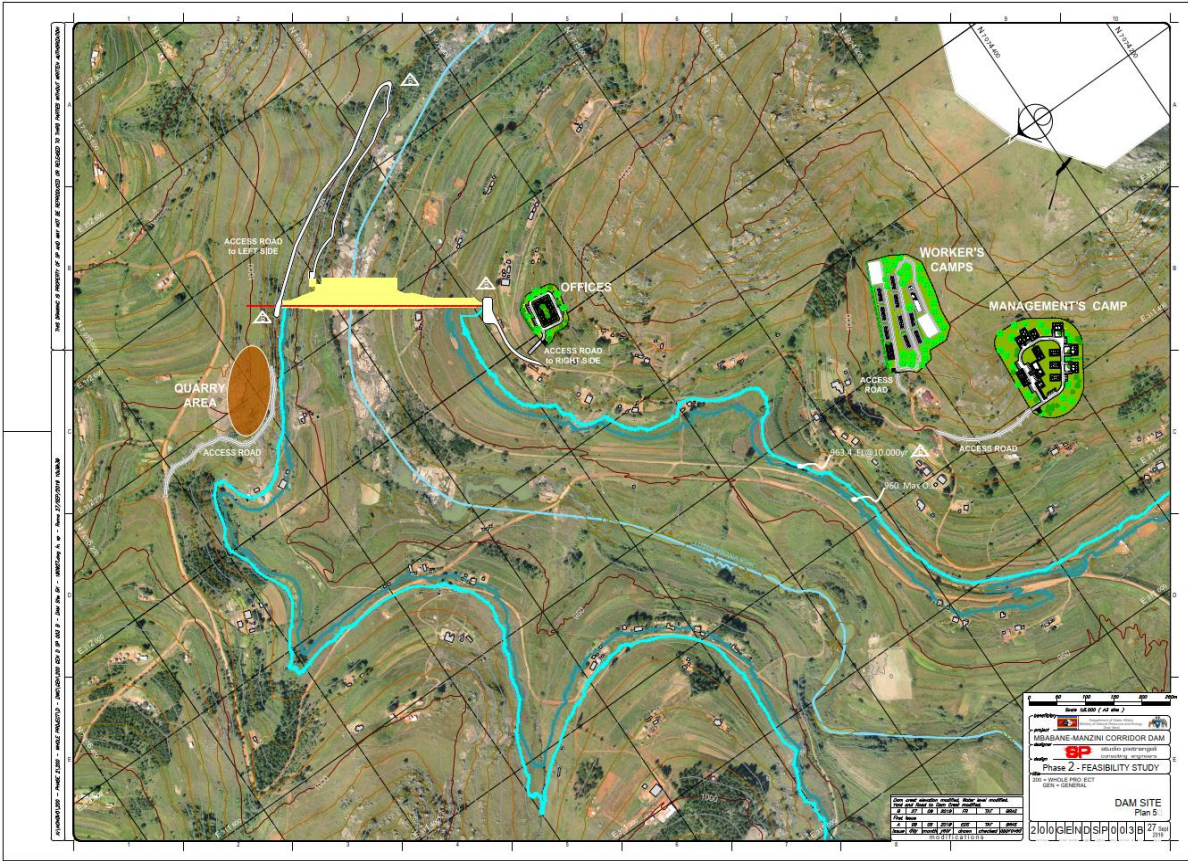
Layout showing the location and extent of the dam wall and associated infrastructure (quarry, site camps and offices, access roads)
